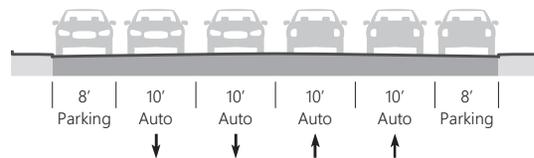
GAGE AVENUE - EXISTING CROSS SECTION
